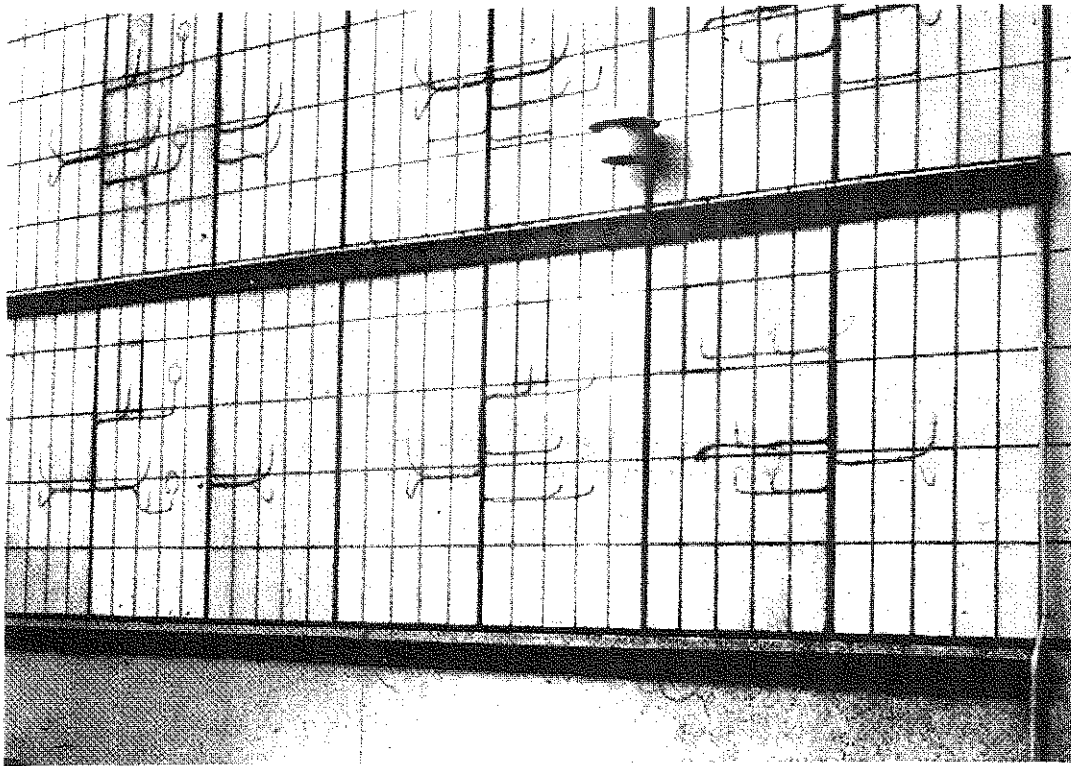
Completed wall with strain-gauged tiles and cables
